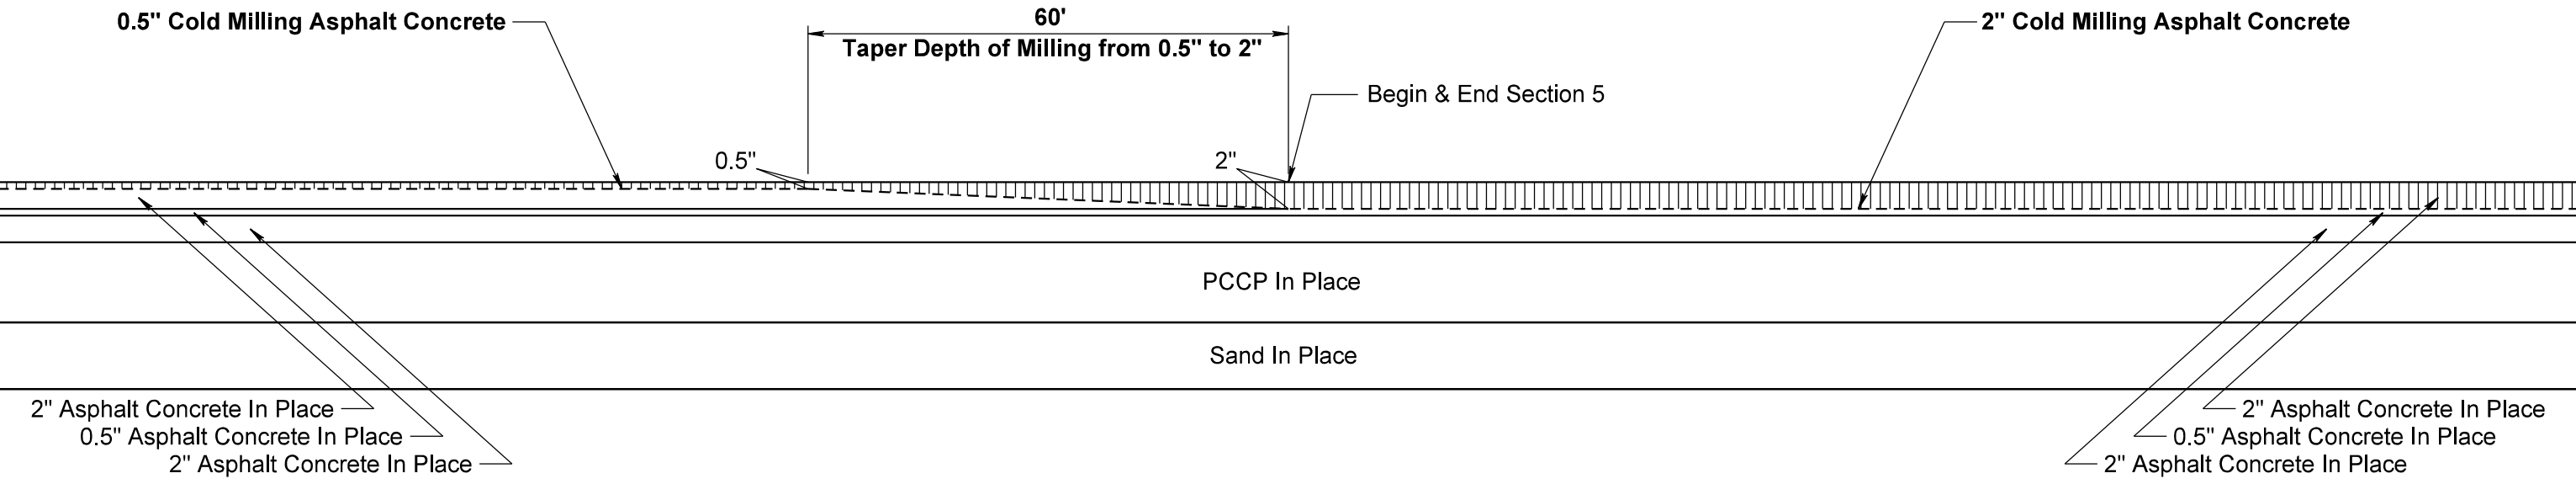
DETAIL FOR COLD MILLING TAPER AT BEGIN & END SECTION 5
